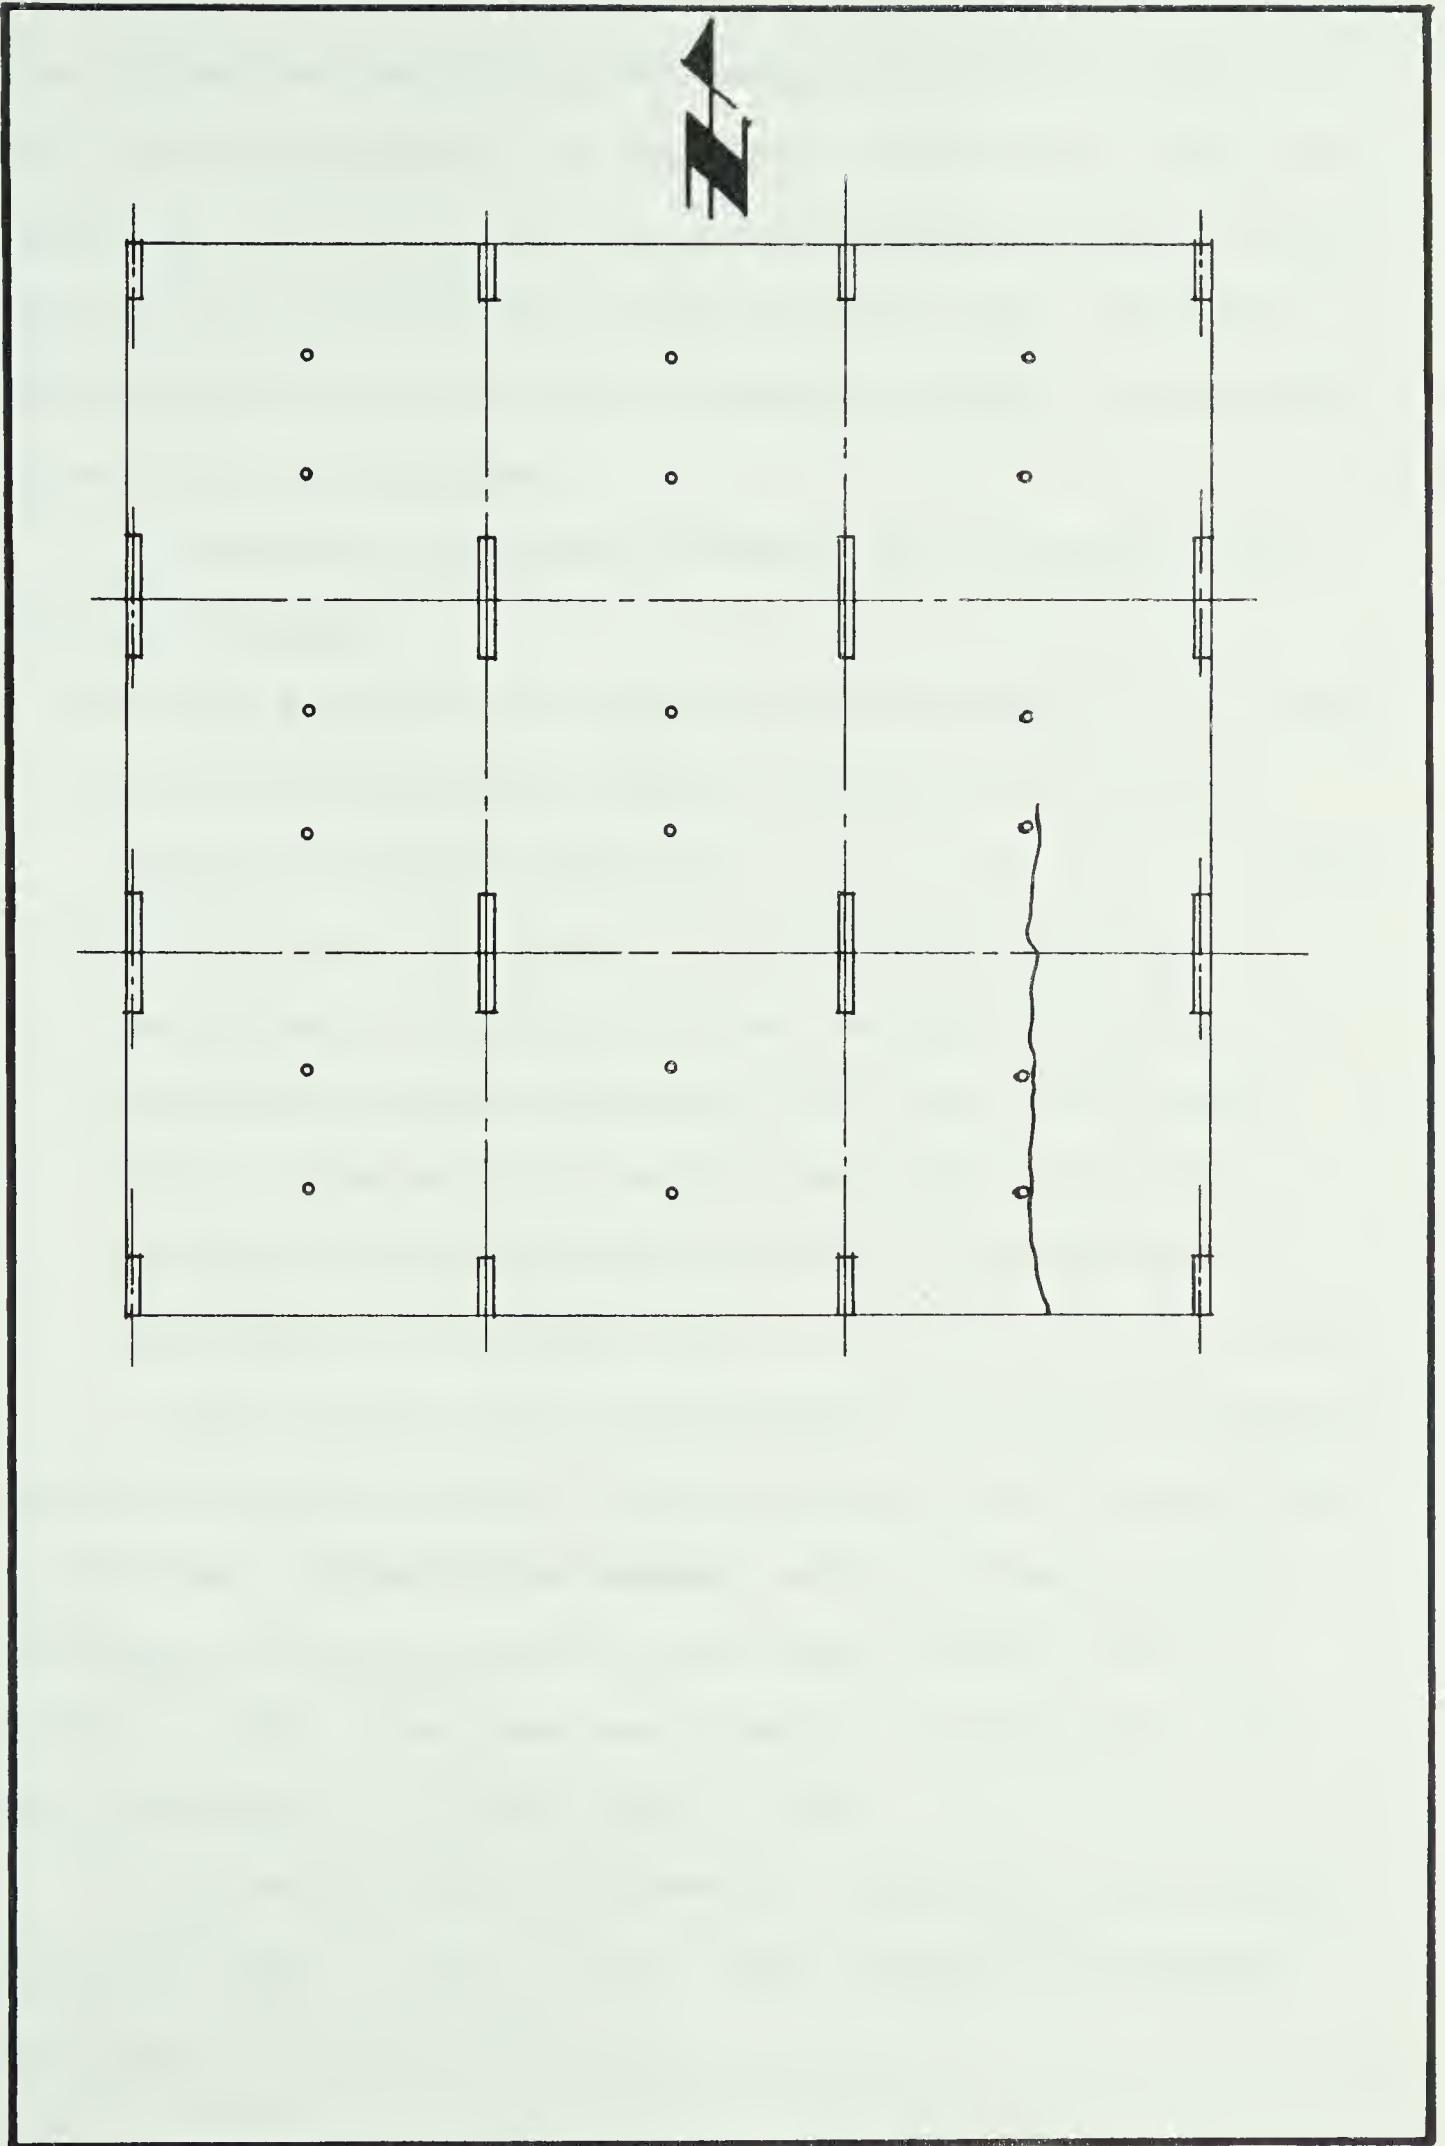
BOTTOM CRACKS AFTER TEST 2
